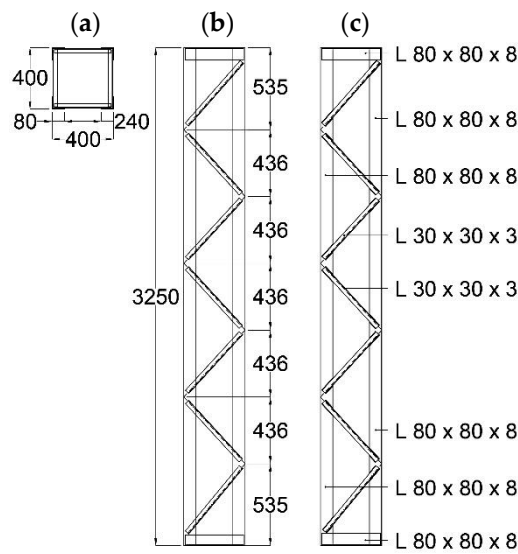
Reticular steel columns: cross section (a), lateral view (b), and constituting profiles (c).
